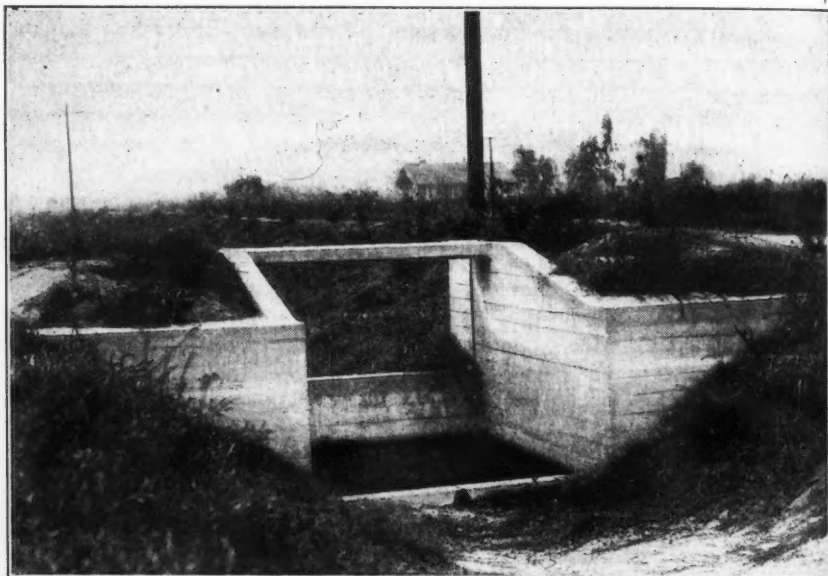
TYPICAL CHECK GATE AS USED IN SMALL CANAL—HEIGHT, 7 FT; WIDTH, 7 FT 8 IN.
